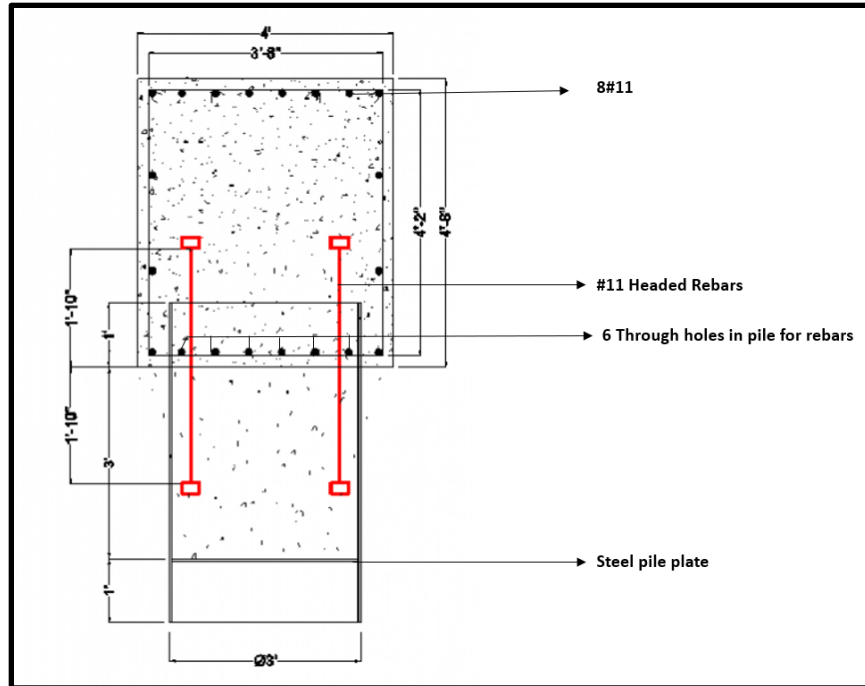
Typical Specimen With Non-Contact Lap Splice Connection; O3: Headed Rebars
